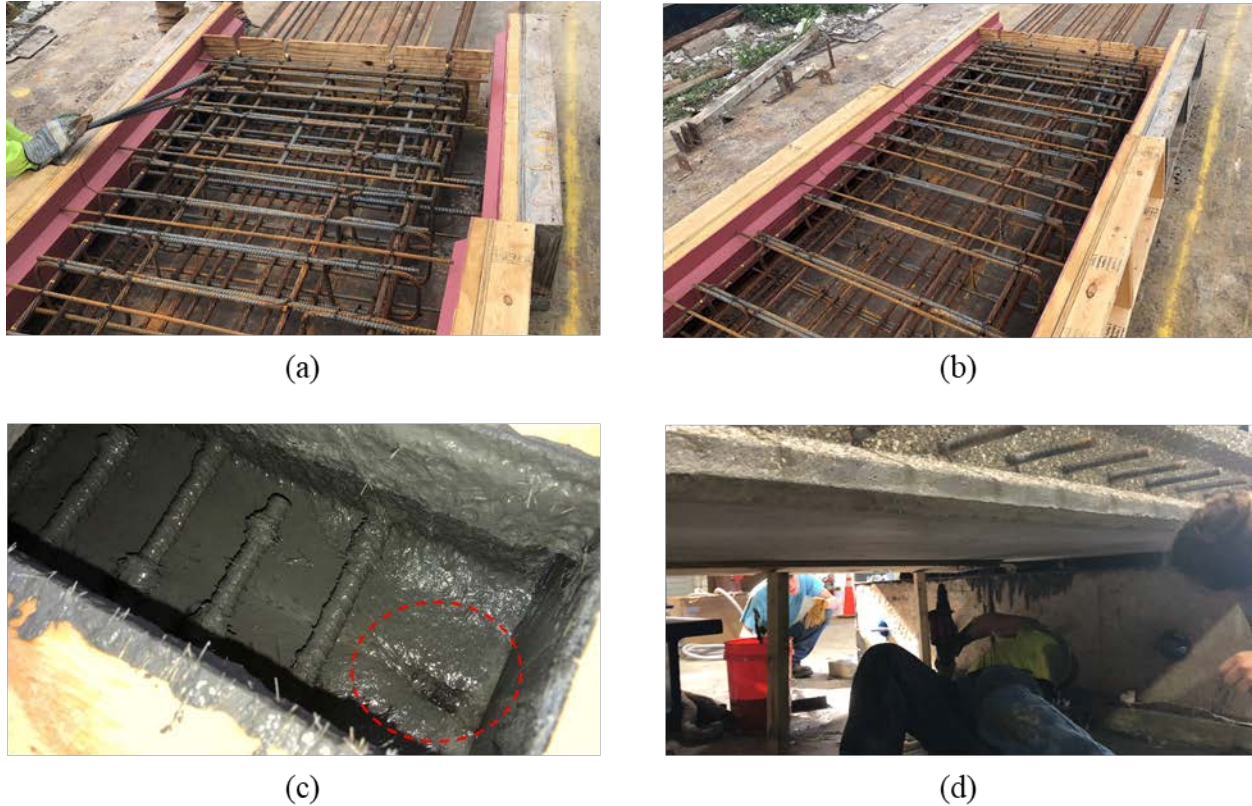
Joint construction observations: (a) side form segments, (b) side form segments attached, (c) UHPC leakage at joint end, and (d) attachment of bottom plywood strip to stop leakage
